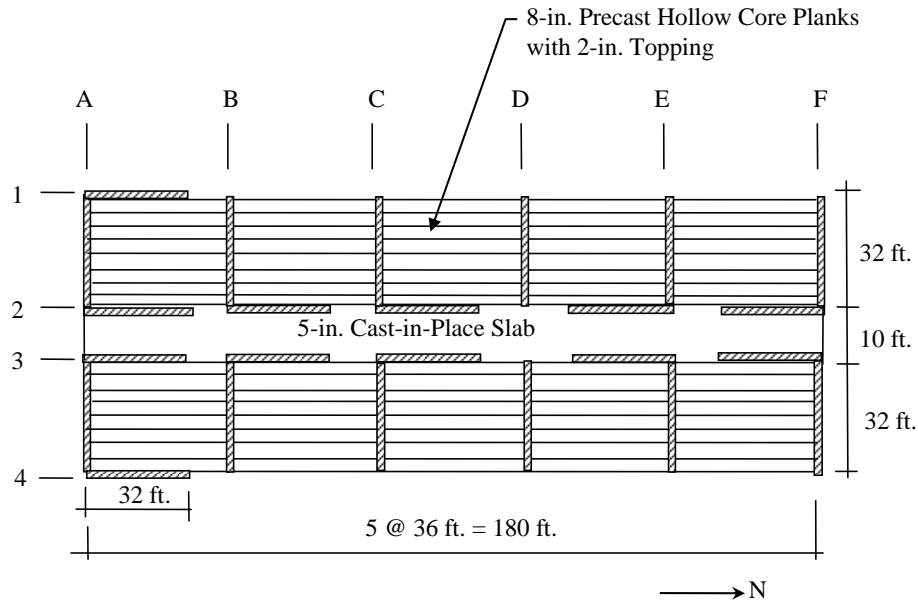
Plan view of typical multistory reinforced masonry shear wall building configuration (design for 12-story SDC  $D_{max}$  shown).
